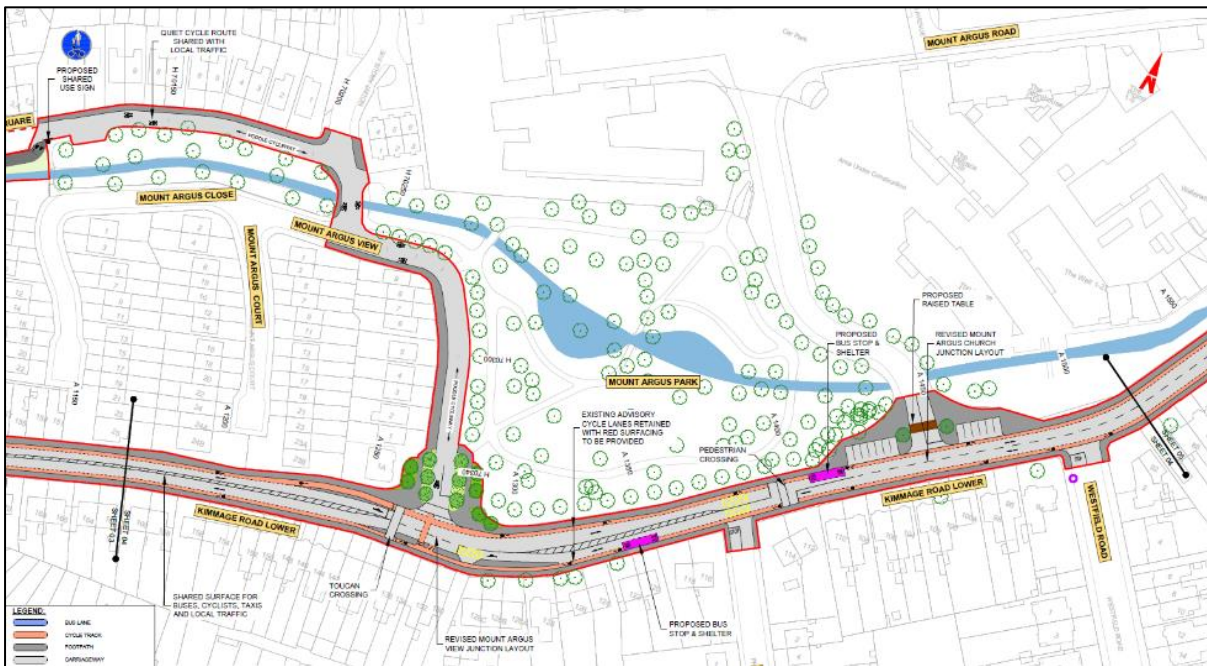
Extract from General Arrangement Drawings (Sheet 4)
